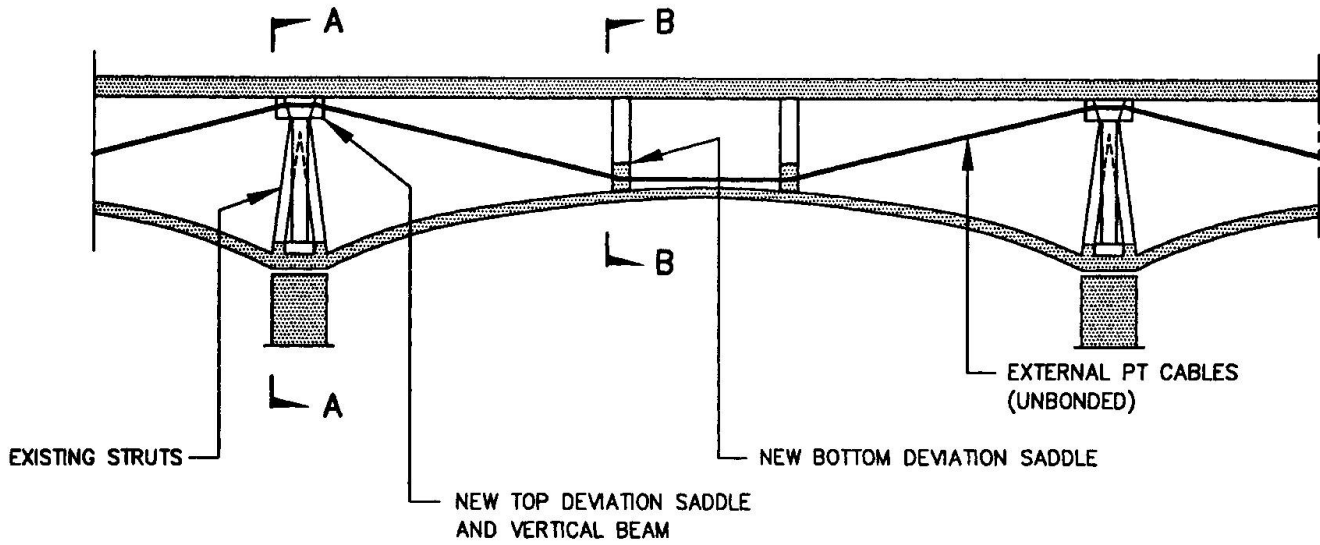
OLERON BRIDGE : CABLE LAYOUT OF ADDED EXTERNAL POST TENSIONING
